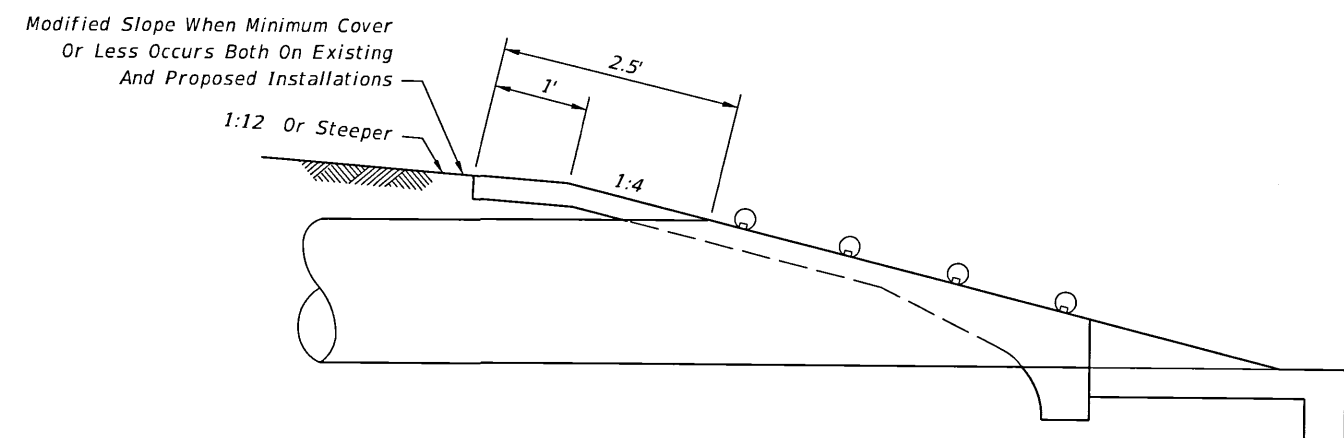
DETAILS FOR CONCRETE & CORRUGATED METAL PIPE
